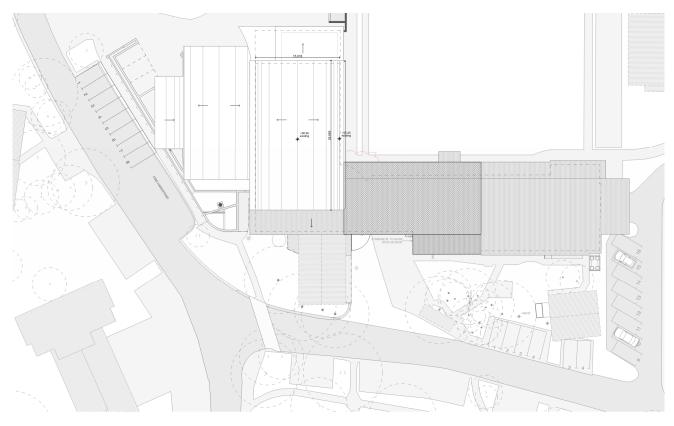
Architectural Existing Site Plan dwg A002 (Source: McNally Architects);
